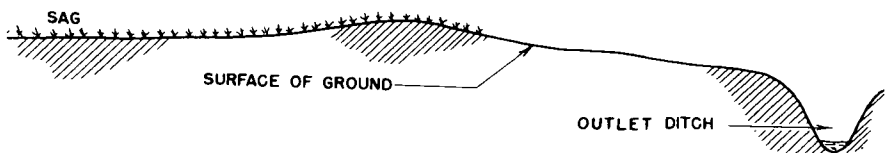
Cross section or profile showing, at left, a sag where water collects and, at right, an outlet ditch into which the water can be drained.
